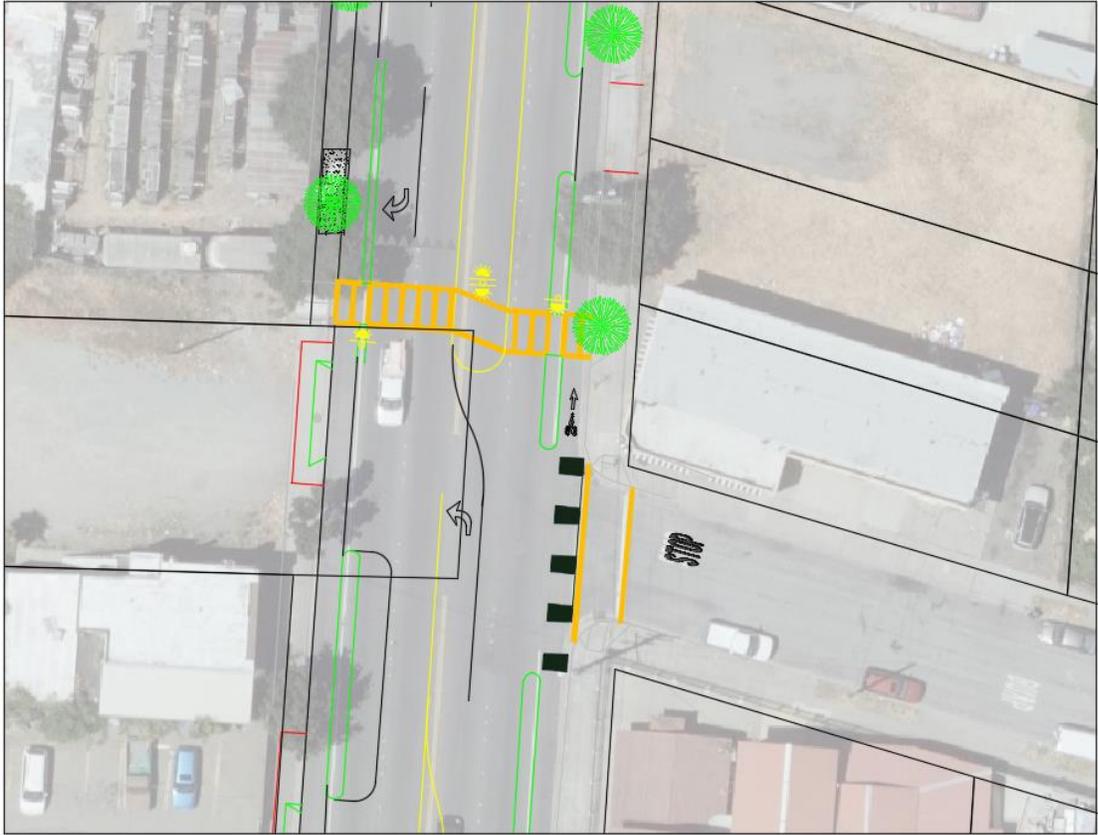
Rumrill Boulevard and Sutter Street RRFBs
